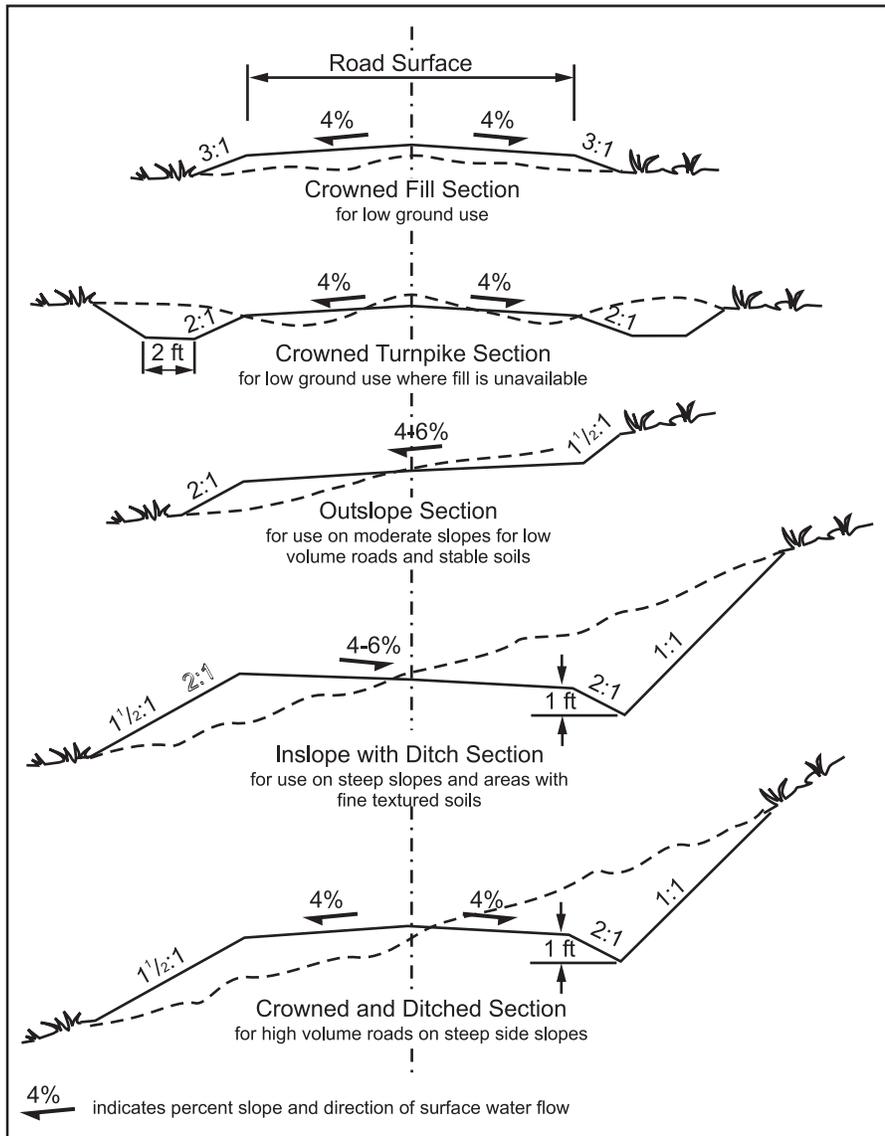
Typical road profiles for drainage and stability. Choice of cross section depends on drainage needs, soil stability, slope, and expected traffic volume. Dashed lines indicate natural land contour and solid lines indicate constructed road (Wiest, 1998).
